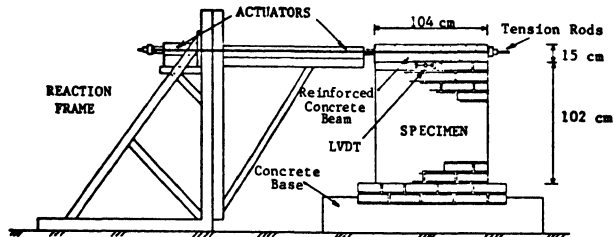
TESTS SETUP FOR CANTILEVER PIERS
